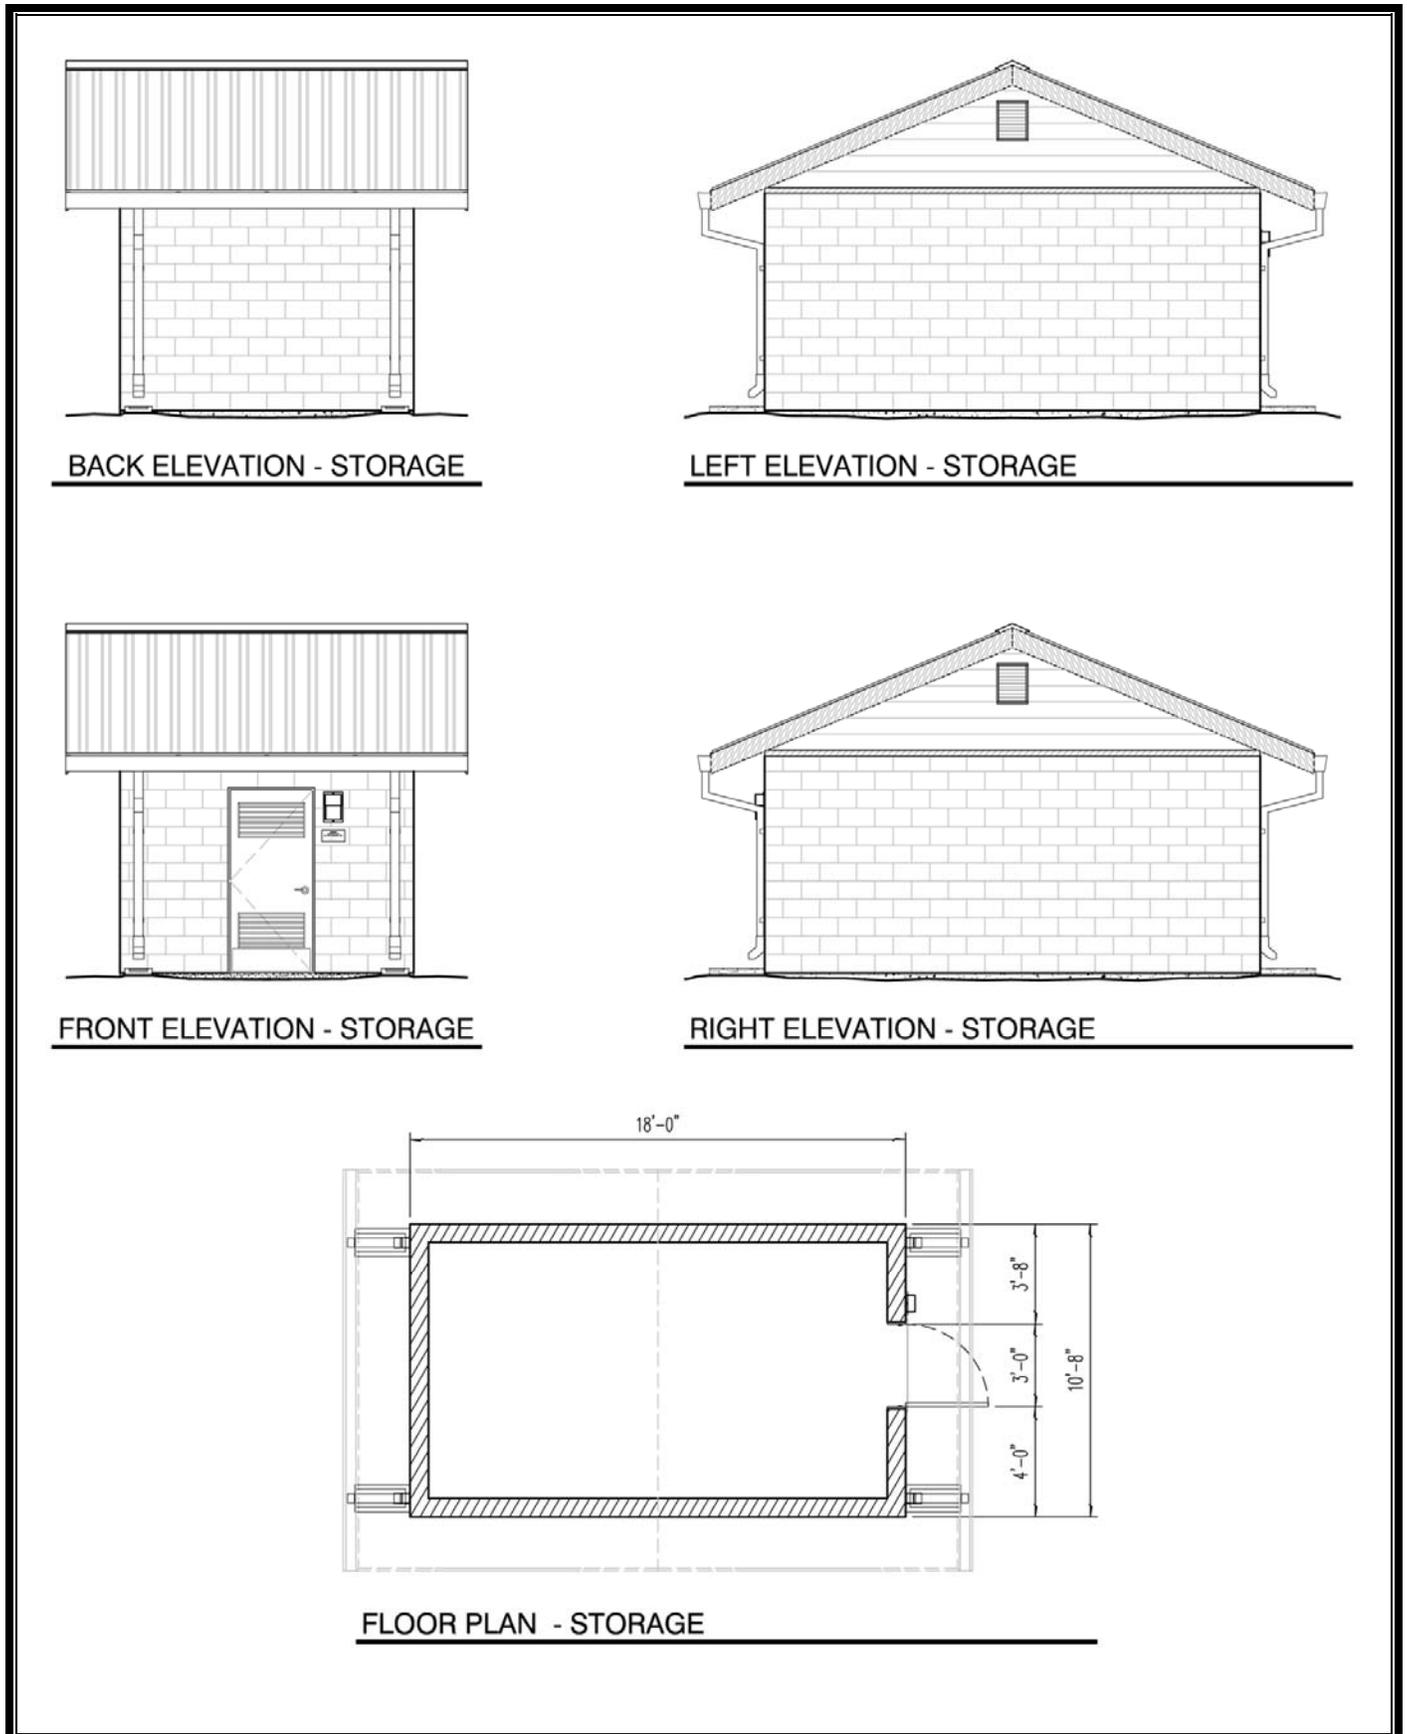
Schematic Plan & Elevations (pending final design) – New storage building.
